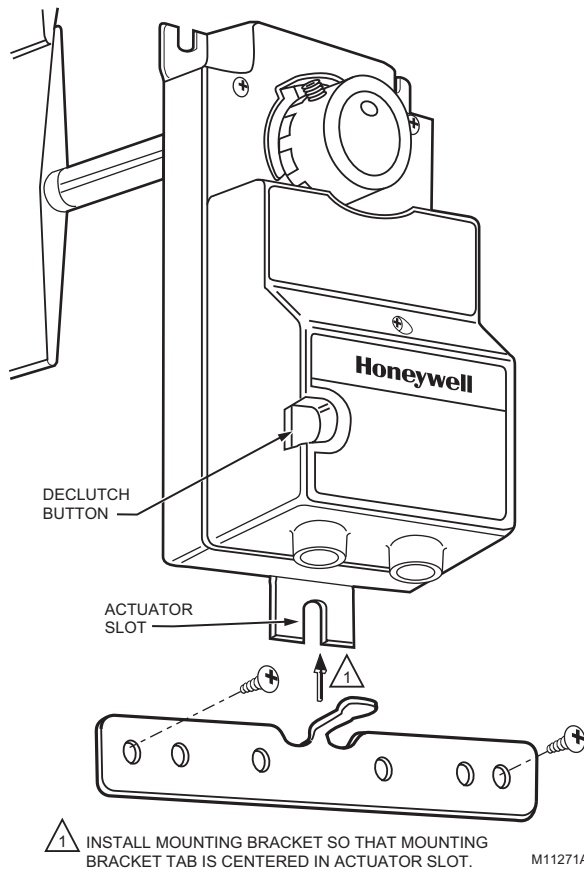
Installing mounting bracket on ML6194/ML6294 Non-Spring Return DCA.
